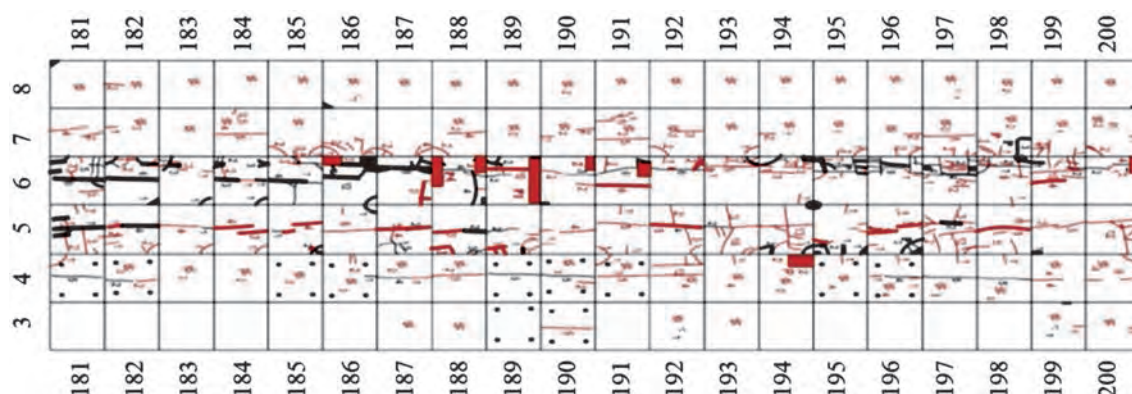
Example record of damage in an airport pavement made from cement concrete
